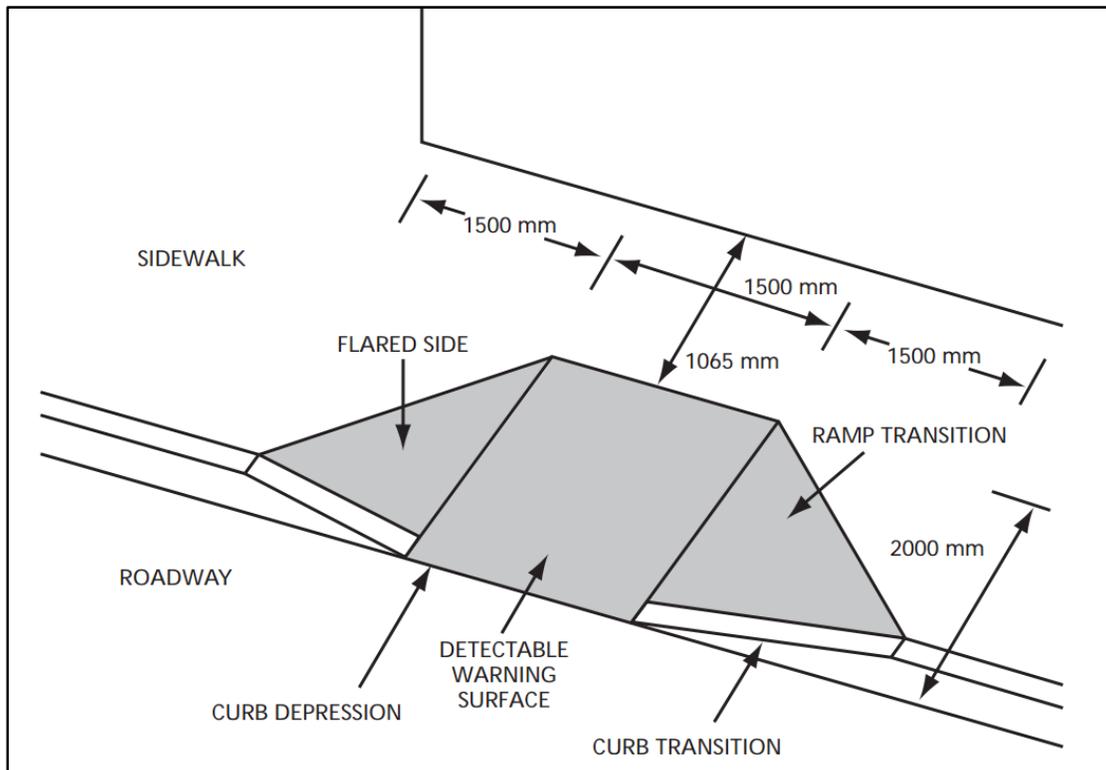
Accessibility standards in sidewalk ramp construction. Taken from [62].
